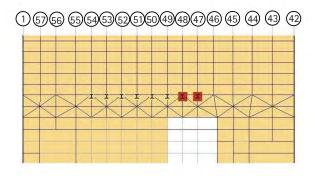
Bridging of north perimeter frame at Stage 4 between Columns 46 and 49 (failed transfer girders shown in red)
